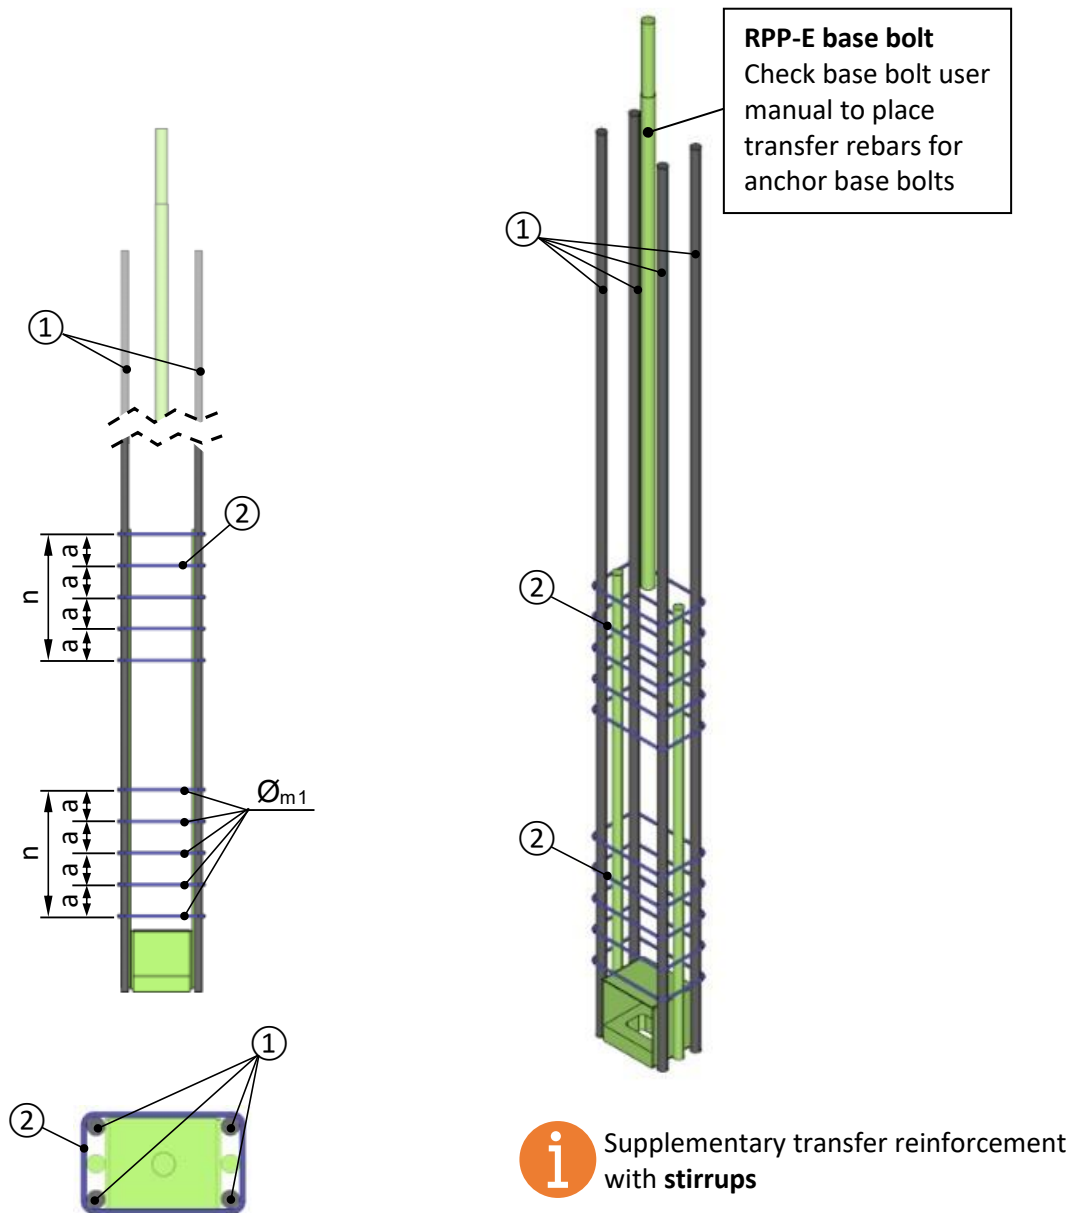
Supplementary transfer reinforcement with stirrups for RSK-E wall shoe
